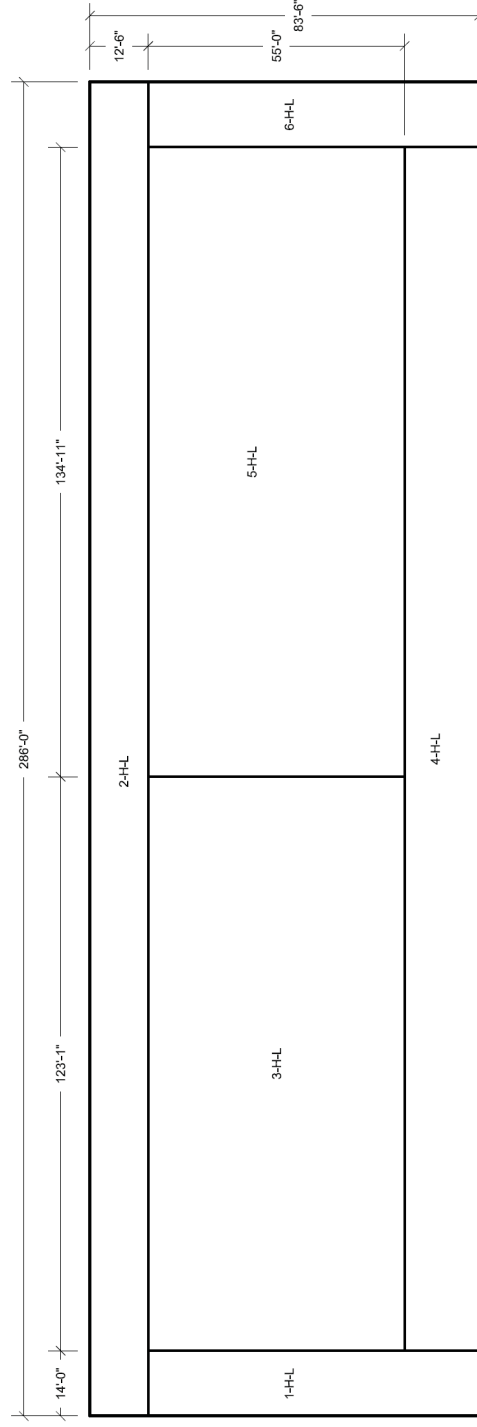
H.6-84: UHS BASIN NORTH WALL LOOKING SOUTH
